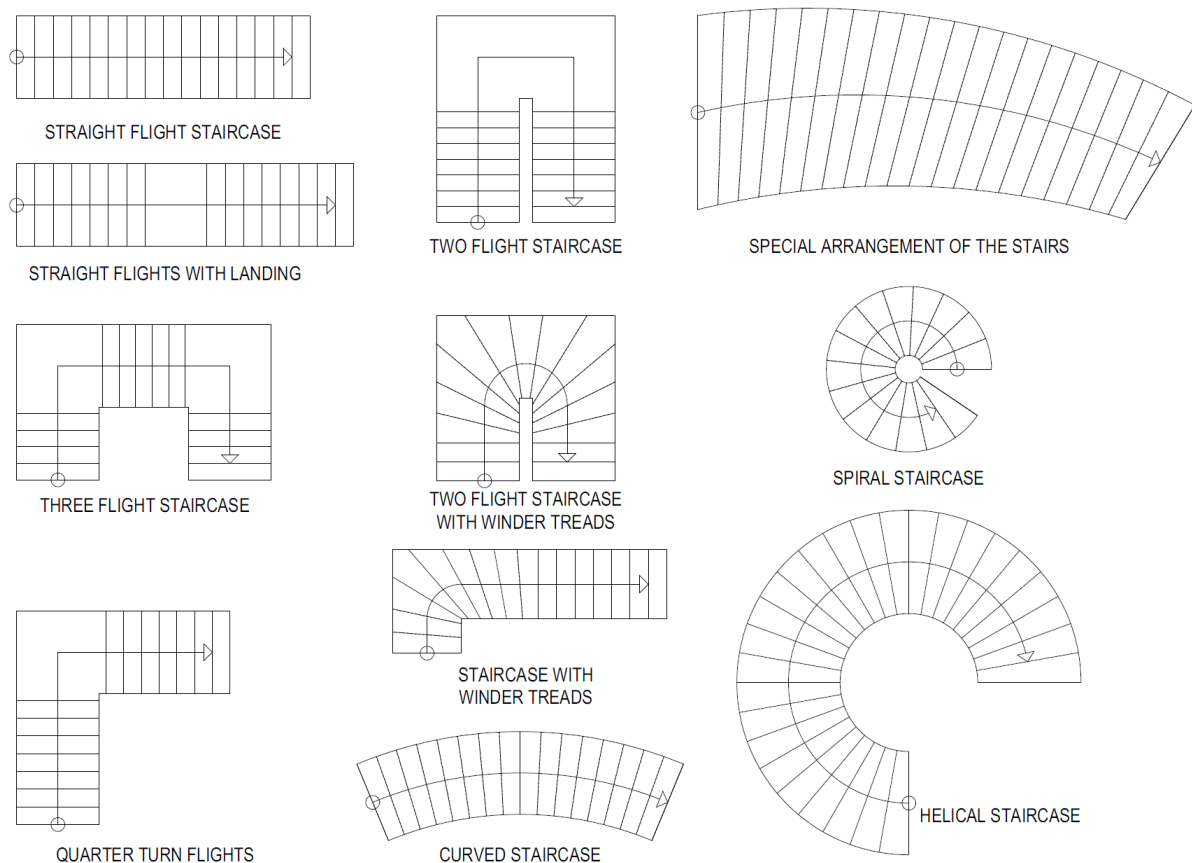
Examples of floor plan layout of stairs (without claiming completeness)
